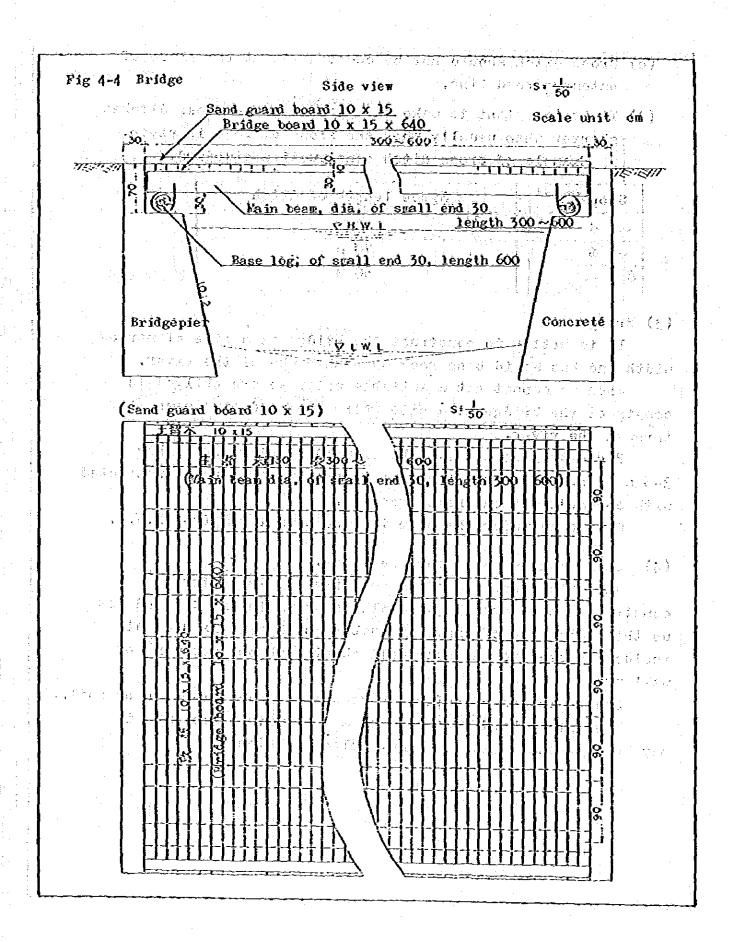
shows the example of wooden bridge which has 3-6 m span. The base of bridge is gravity type and constructed with concrete without reinforcement.
